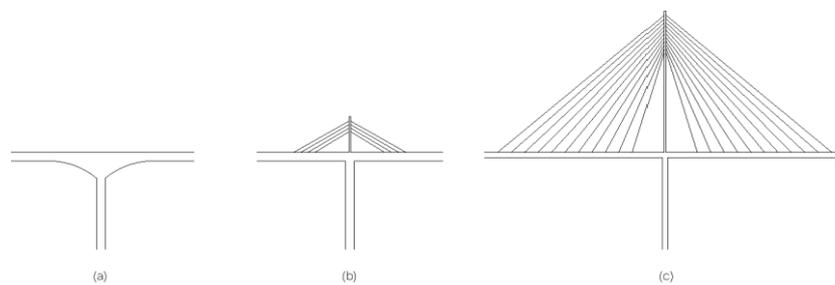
Typical view of (a) girder, (b) extradosed and (c) stay-cable bridges
